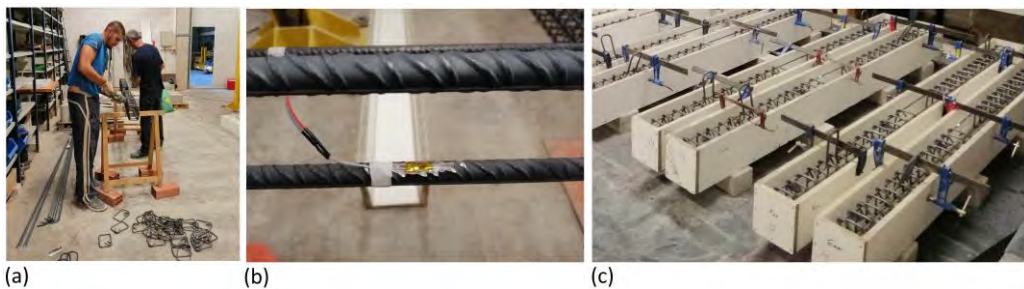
(a) Steel reinforcement preparation, (b) Strain gauge installation and (c) Placing the molds.
